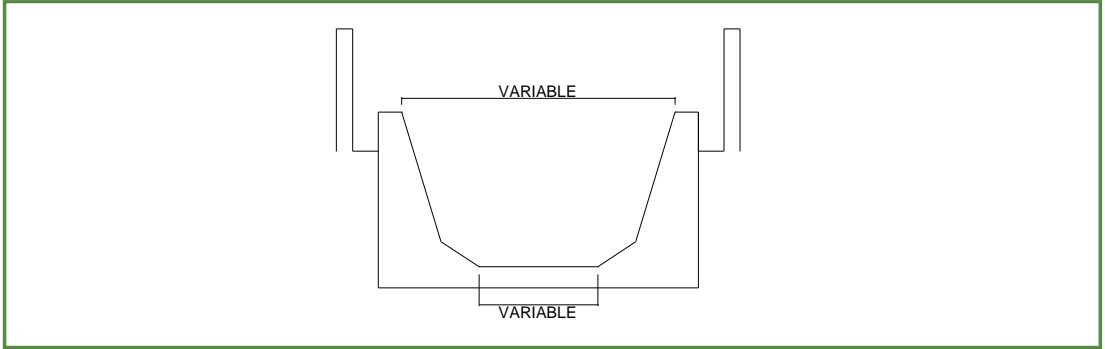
DETAIL OF KALI SURABAYA (MENTENG AREA 2)
